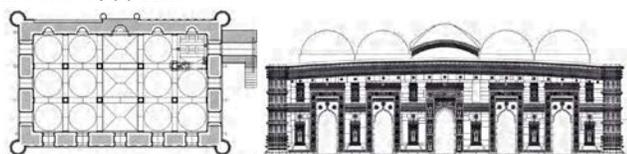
Plan and Front Elevation of Choto Sona Mosque at Chapai Nawabganj.
